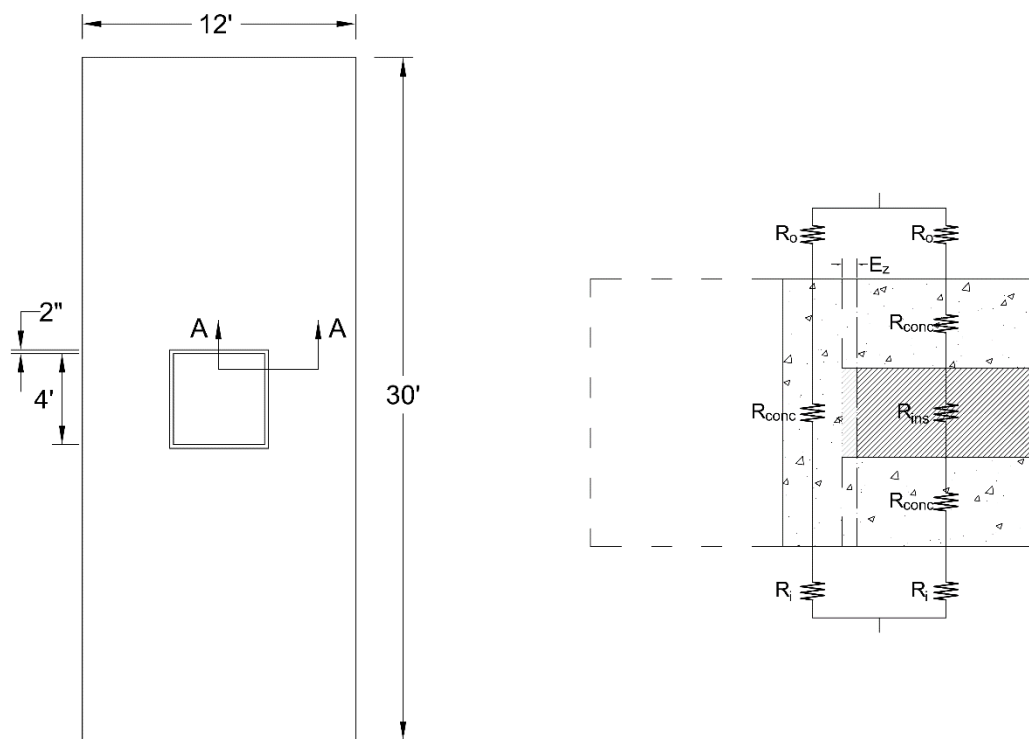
Window example panel layout and cross-section with electrical circuit analogy
